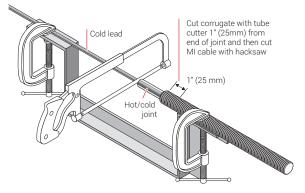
Cut Cold lead and corrugate close to hot/cold joint
